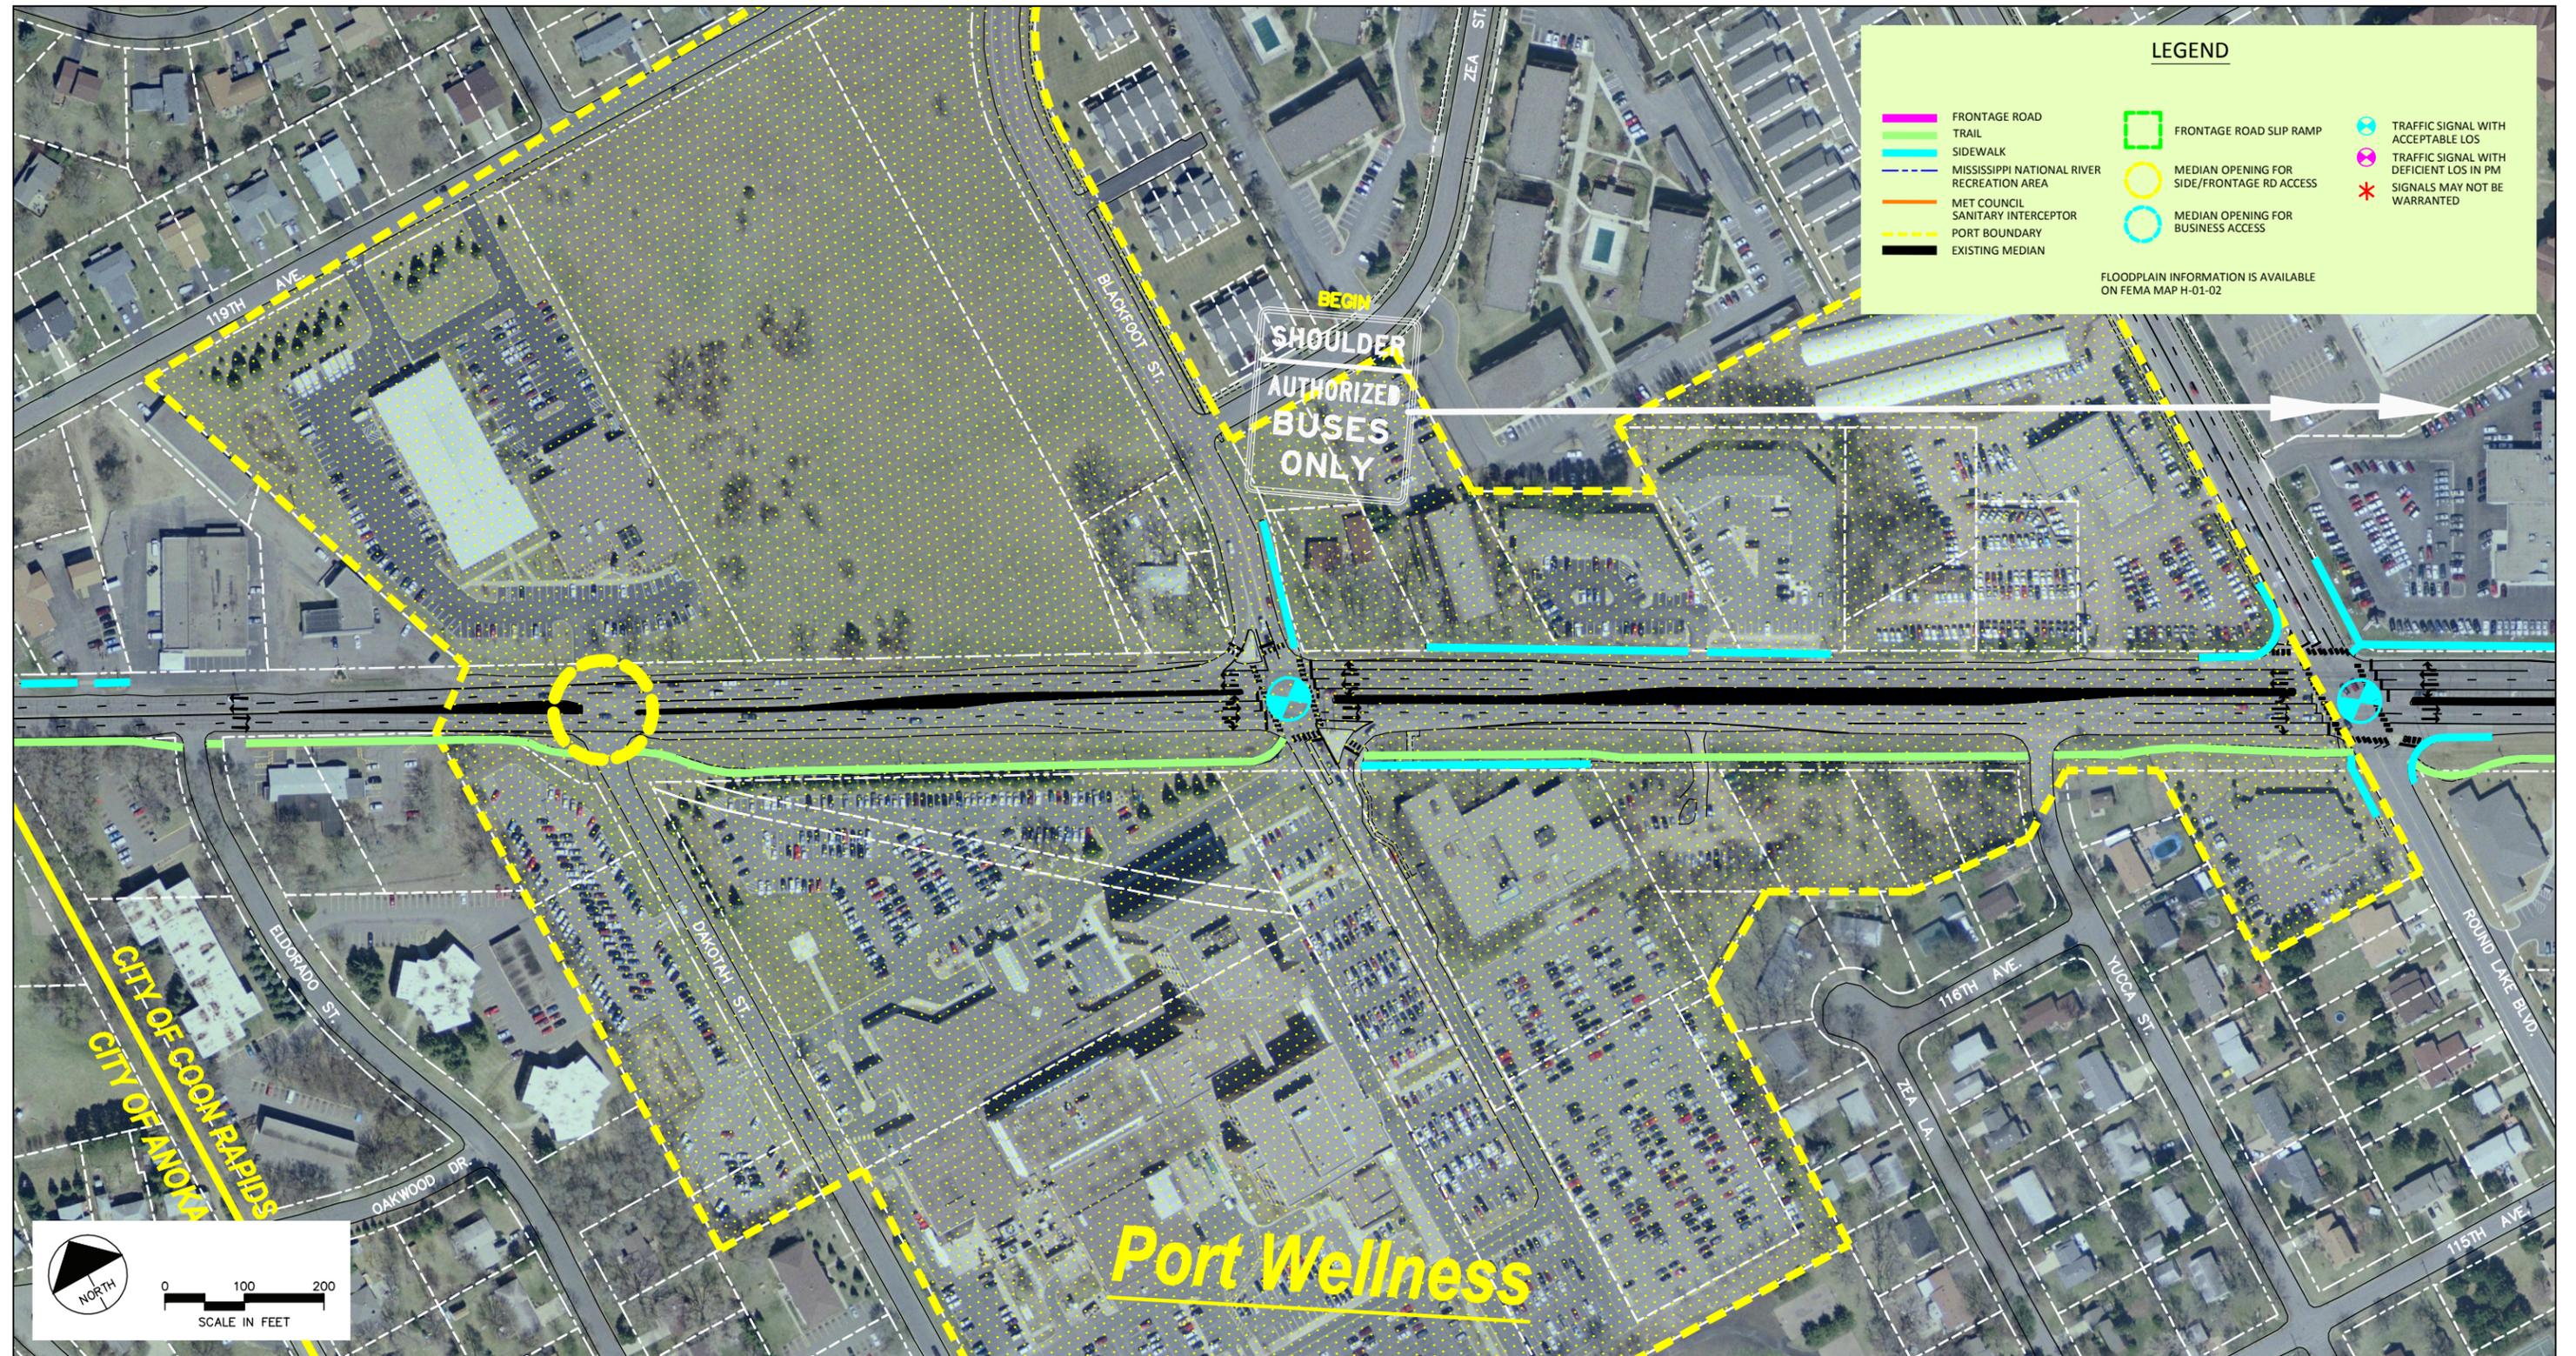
Existing Roadway Features (2 of 15)
